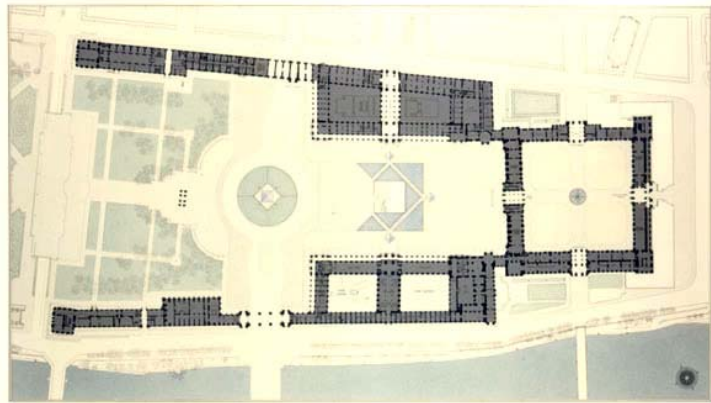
The Louvre ground floor plan showing the original U-shaped building and the entrance to the underground extension.
